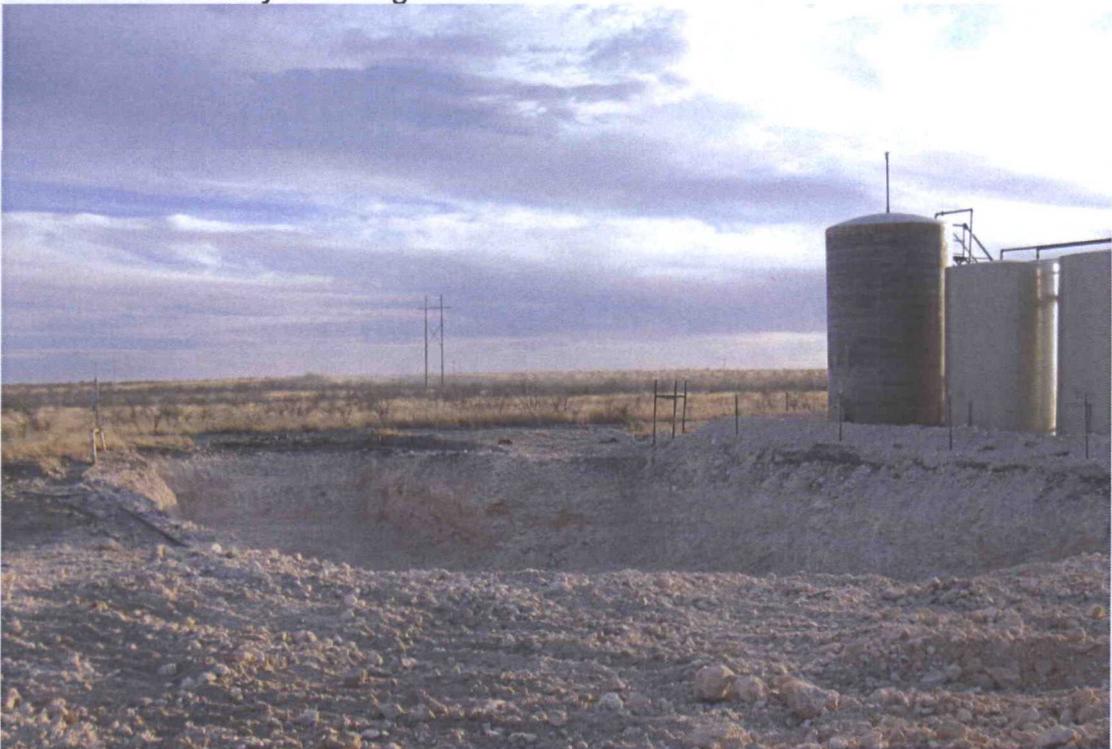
View to the south showing the completed excavation and the re-built tank battery to the right.
